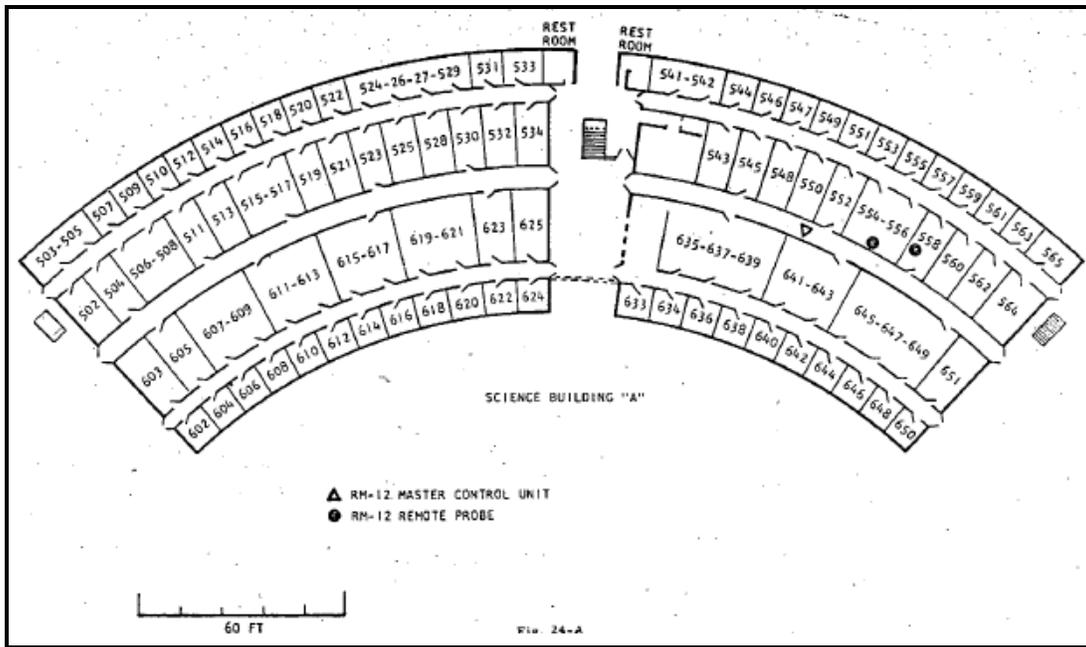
Floor plan of Science Building A (SNM 1963).
